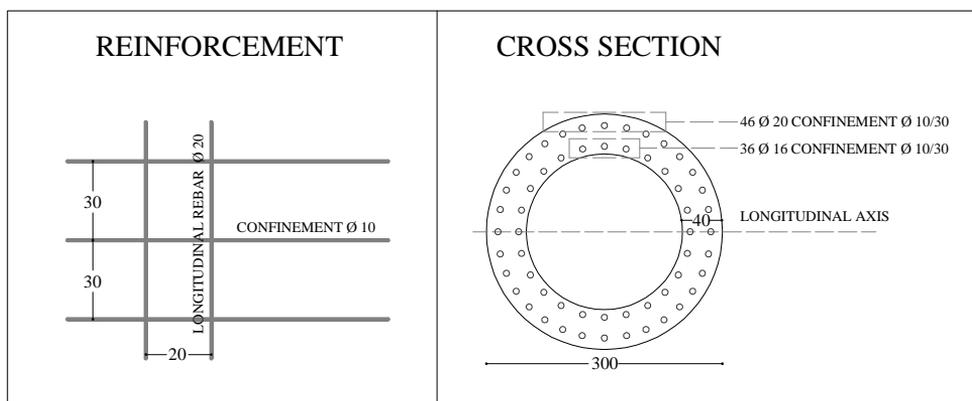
Cross section and structural detail for base piers. Dimensions are in centimeter and millimeter
